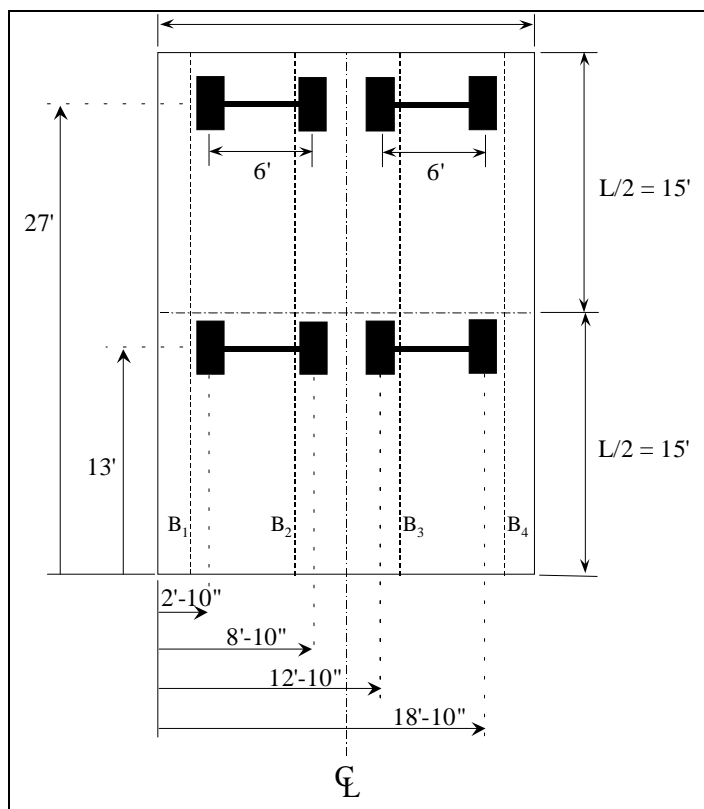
Load case 2 — two symmetric trucks, Wickwire Run Bridge.
